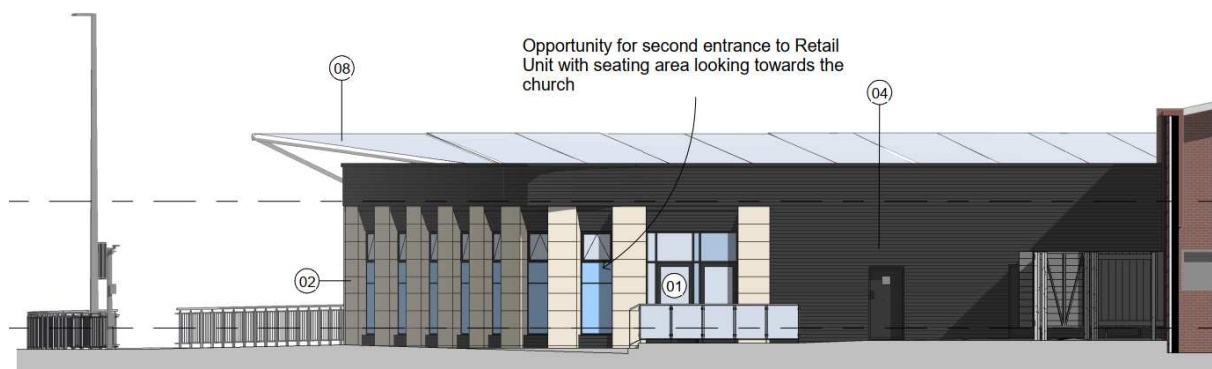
Retail Unit Elevation facing Public Landscaped Space
